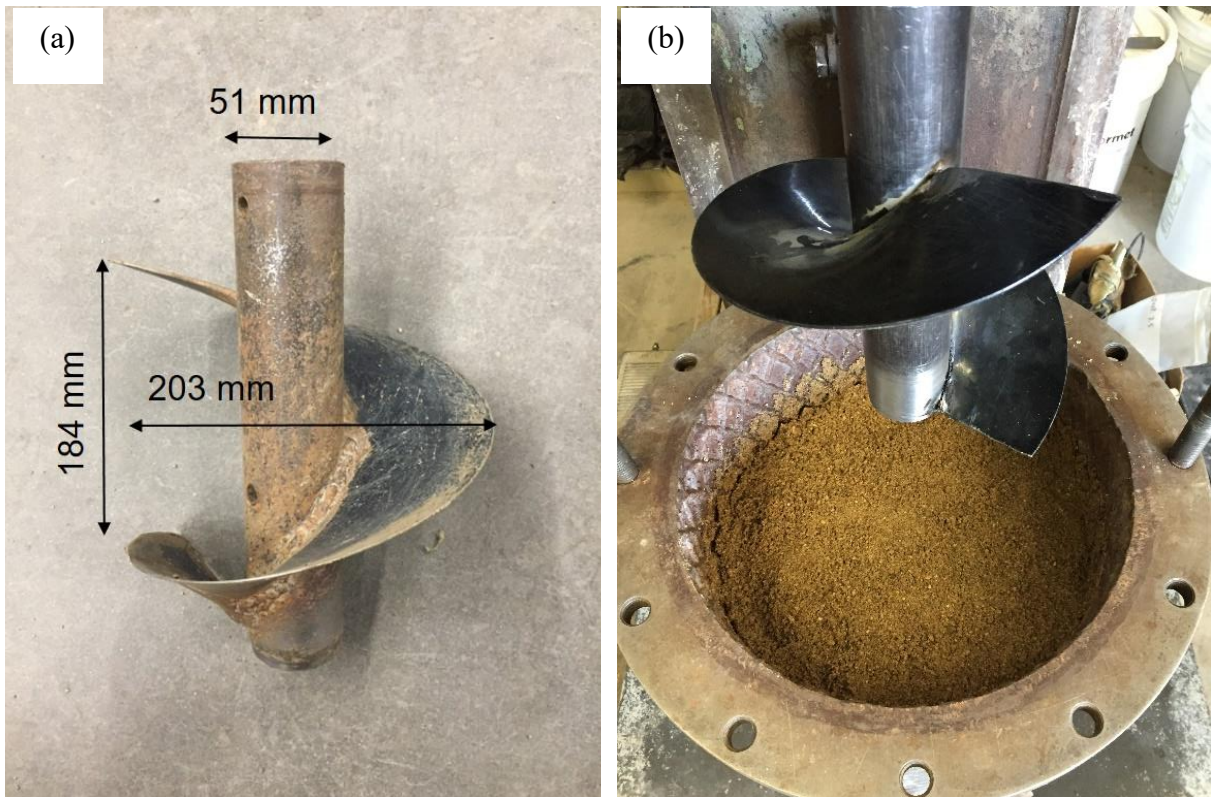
Small single-flight auger propeller: (a) dimensions; and (b) installed auger on shaft.
